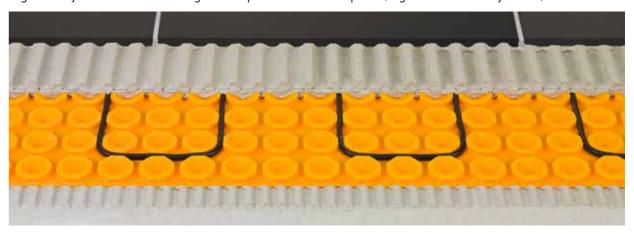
System of floor heating cables placed on a base plate with a built-up thermal barrier (Figure: Schlüter-Systems)
